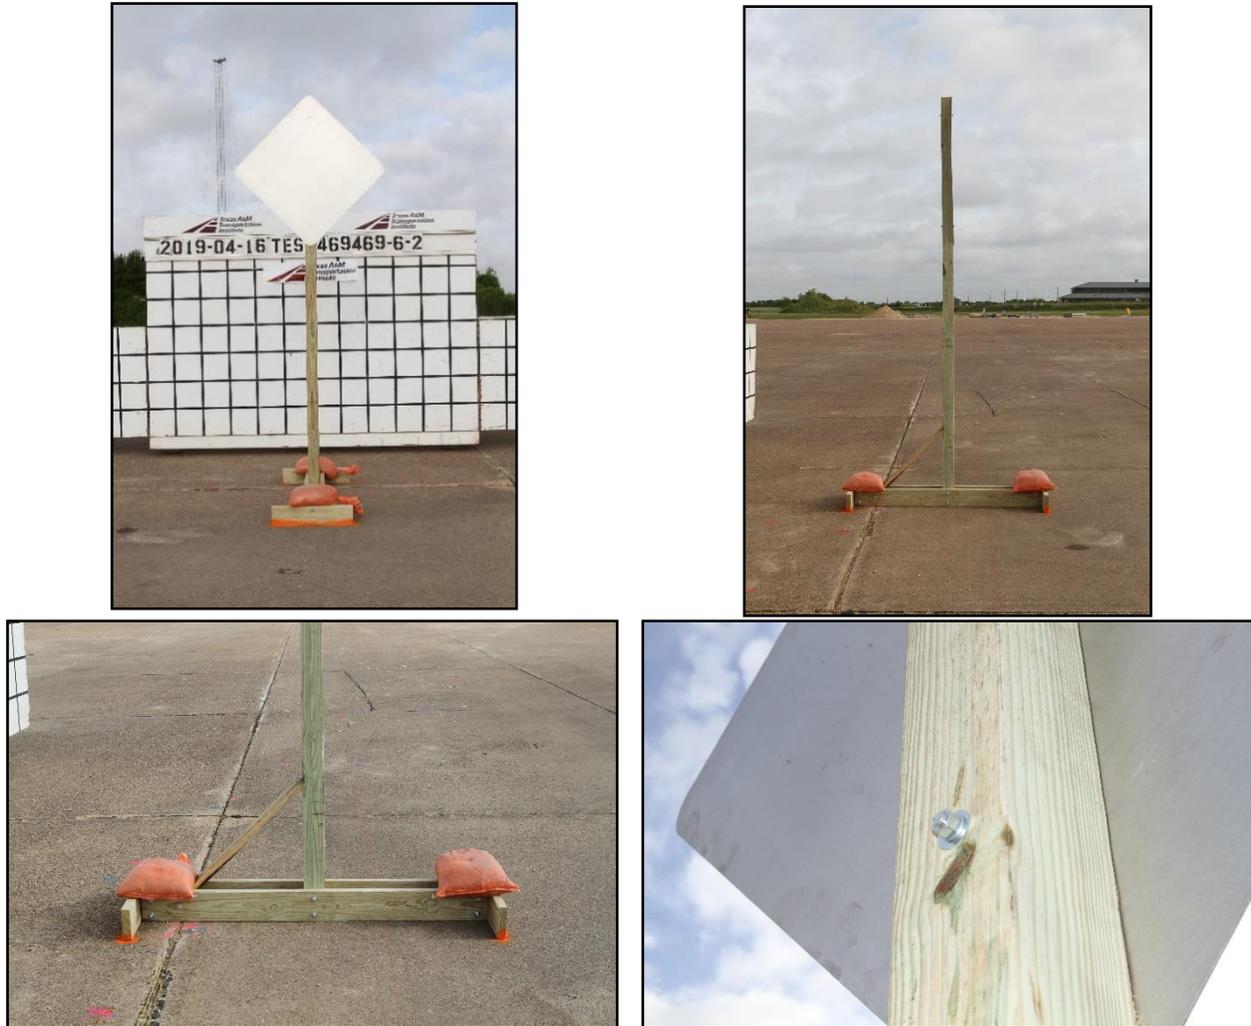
Single Wood Post Skid-Mounted Sign prior to Test No. 469469-06-02.
